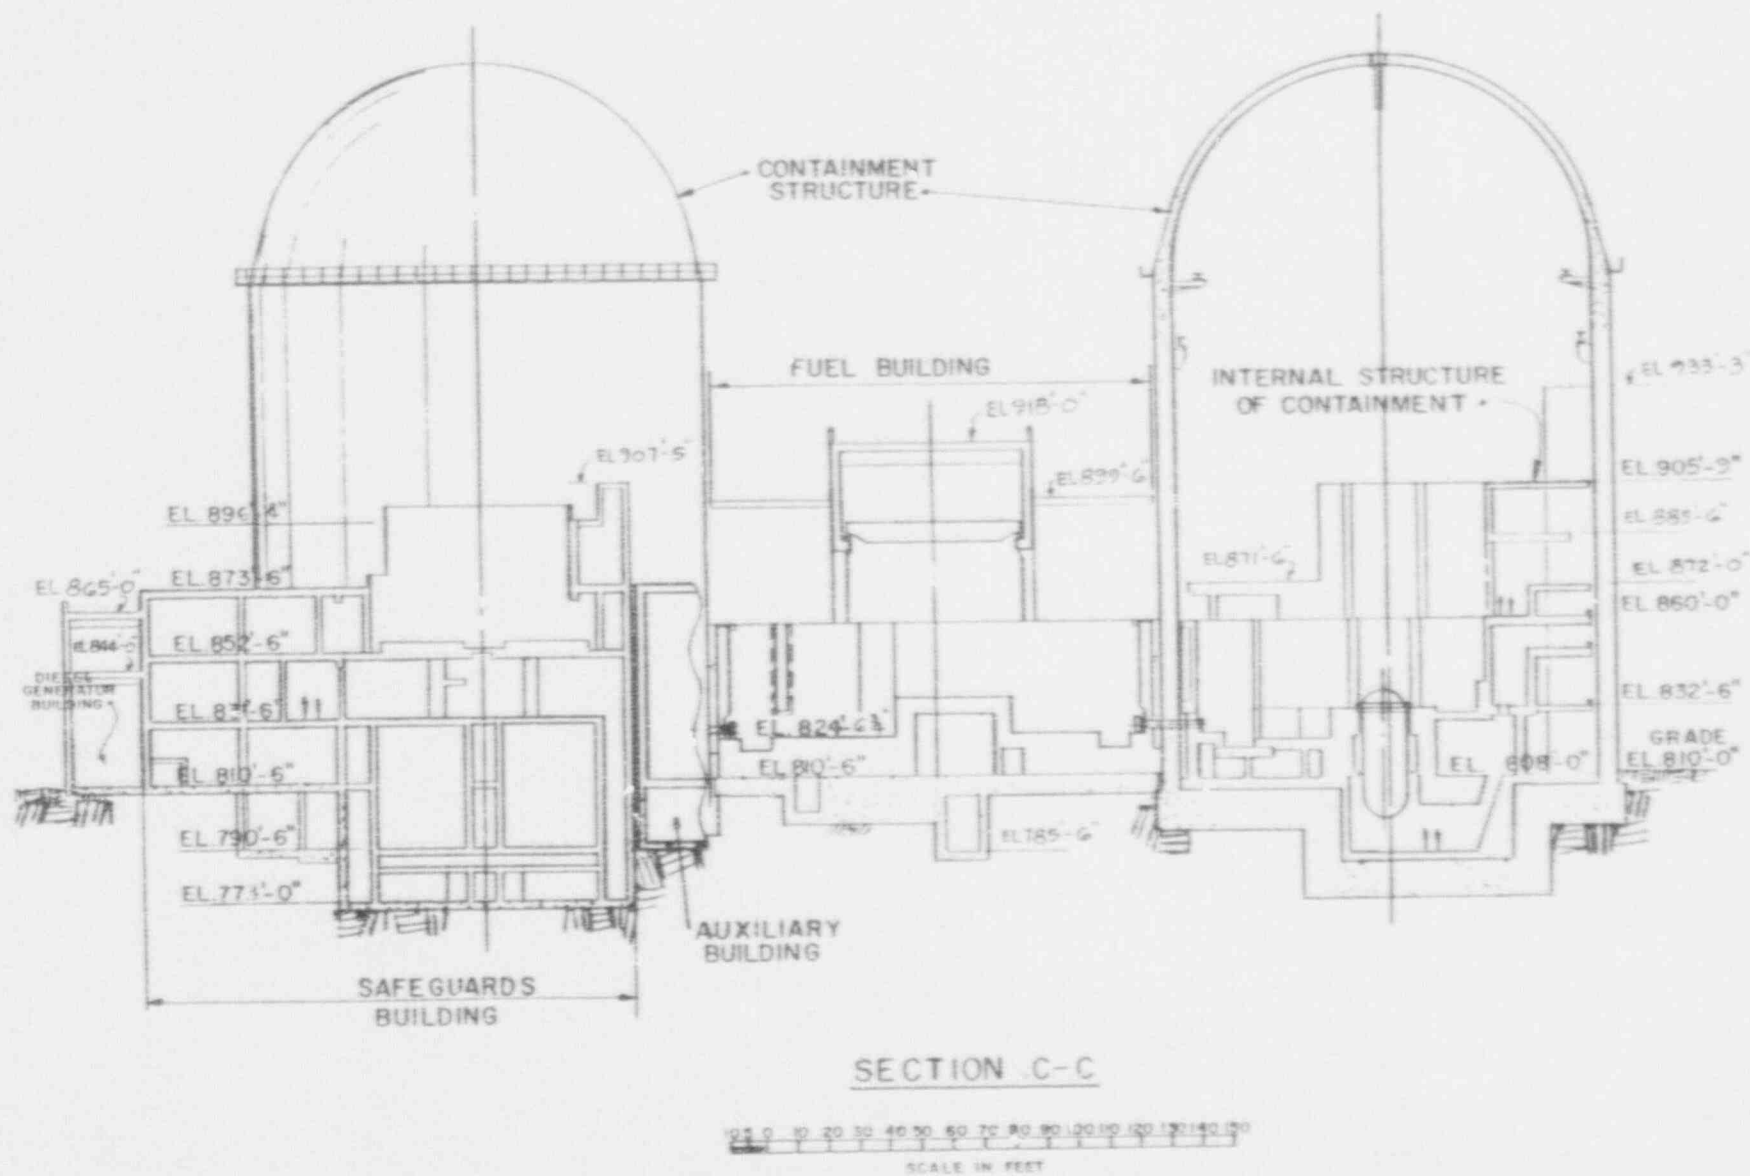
Structural Plan Arrangement (Section C-C)
